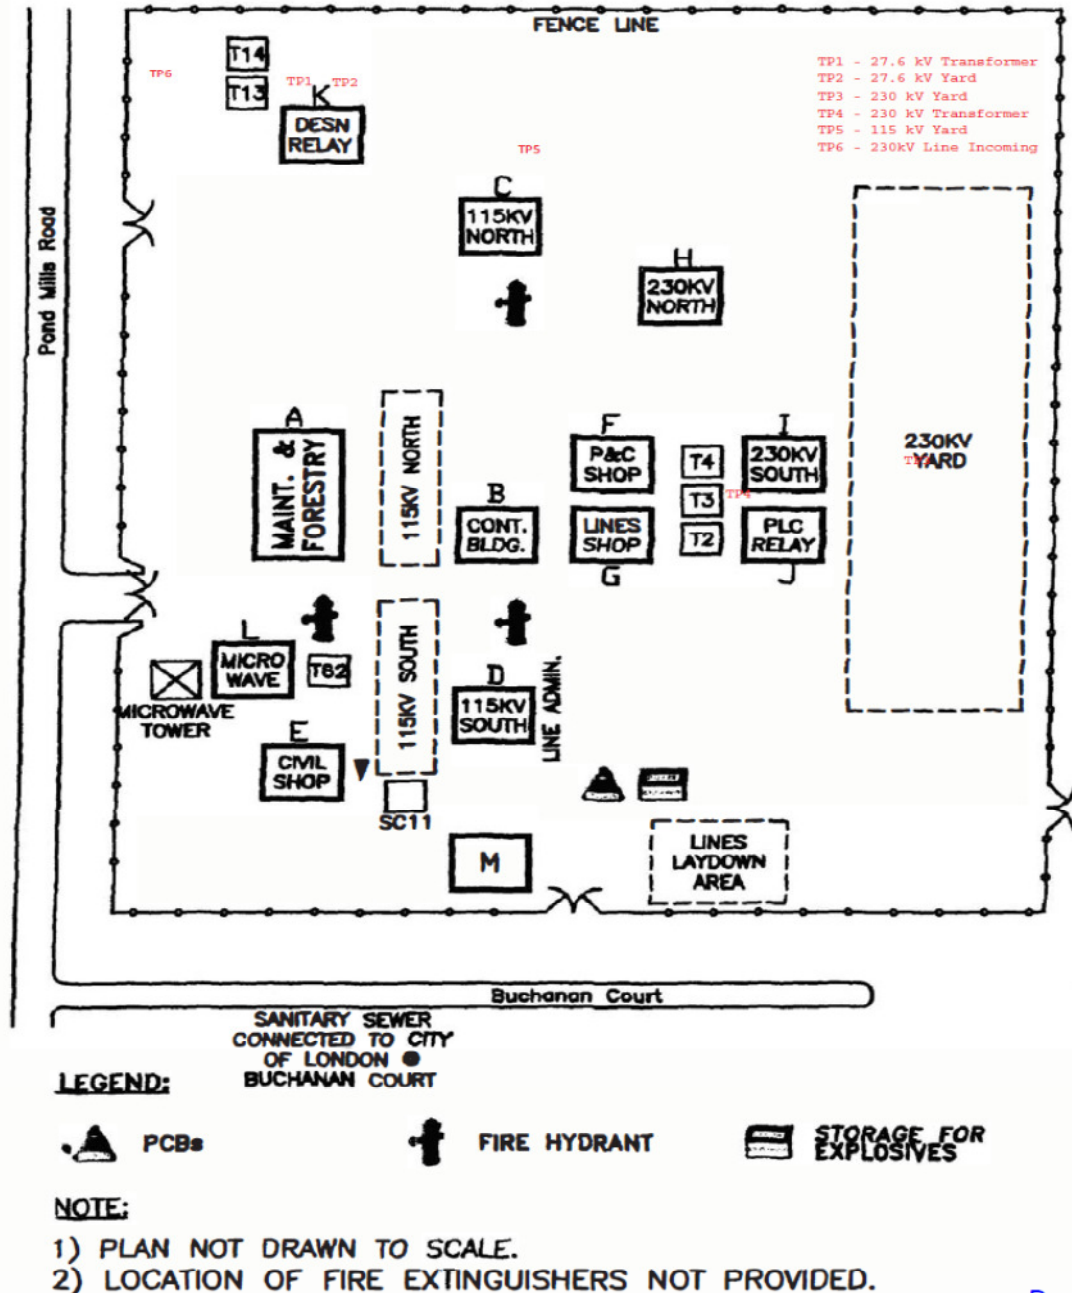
Substation layout of Buchanan distribution substation, London, ON
